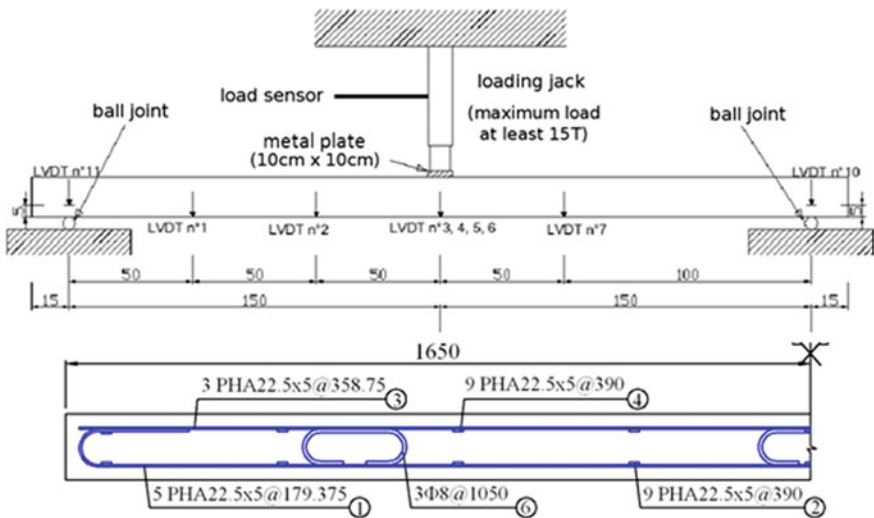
Slab–beam dimensions, type of reinforcement and loading conditions
